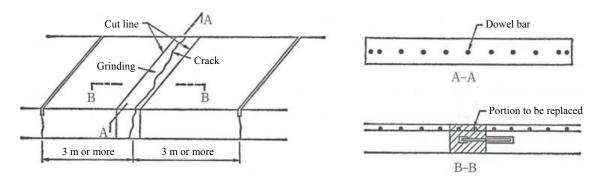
Local replacement on a portion with transverse cracking 18)
